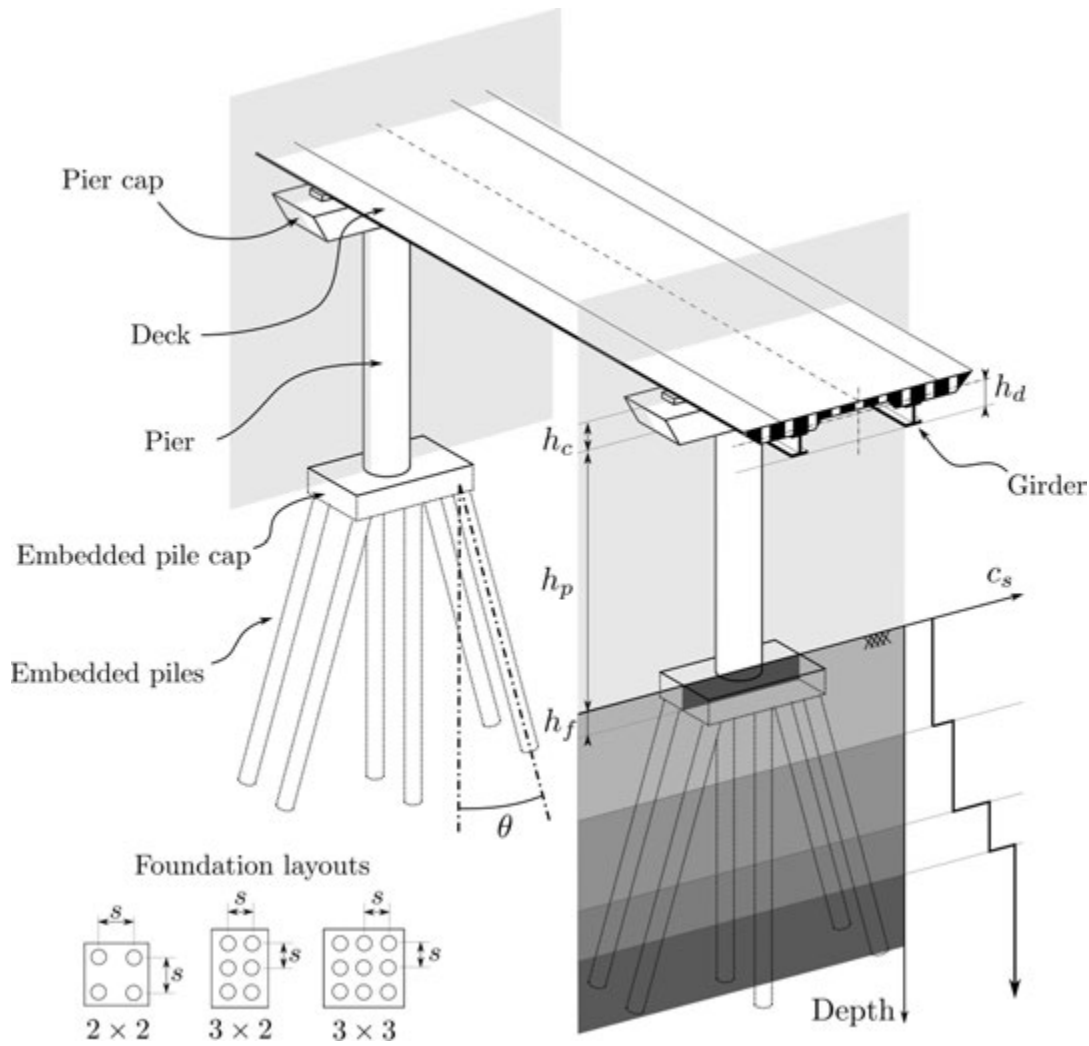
Soil – piles foundation – superstructure system and foundation layouts.
